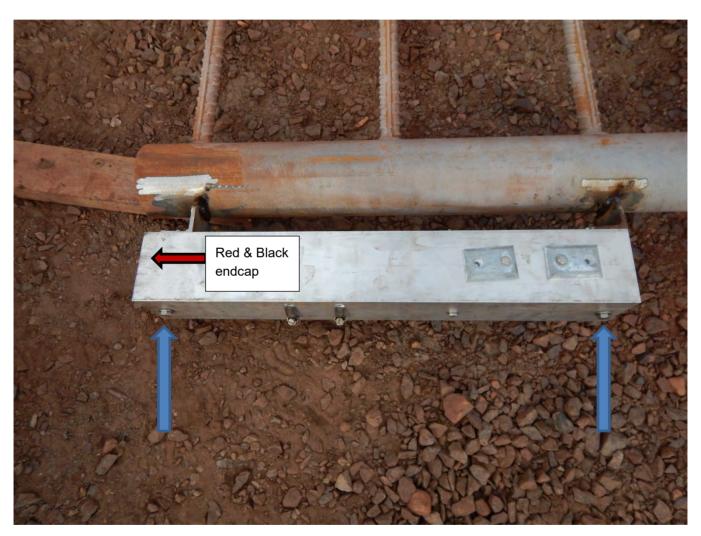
Aluminum square tube mounted to the bottom of the steel ladder located at the ore dock. Arrows show location of mounting bolts which attach the square tube to the welding tabs on the steel ladder.
